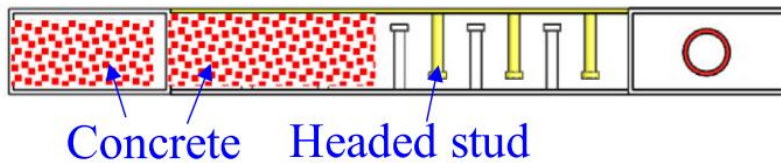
Details of overlapped headed studs (Yan et al. 2018).
